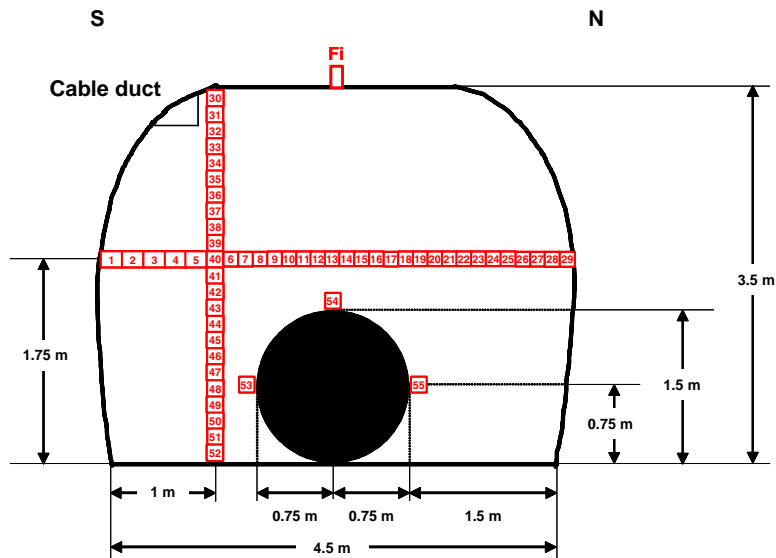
Backfill sampling locations (samples 1 to 29 in horizontal direction, samples 30 to 52 in vertical direction, samples 53 to 55 at the cask/backfill-interface) and rock sampling locations in the roof (samples Fi) for porosity and permeability measurements in cross section B⁺¹
